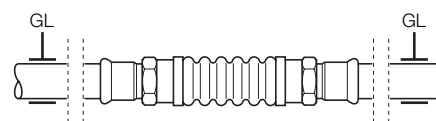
Commercially available axial compensator with female thread and Mapress adapter with male thread
